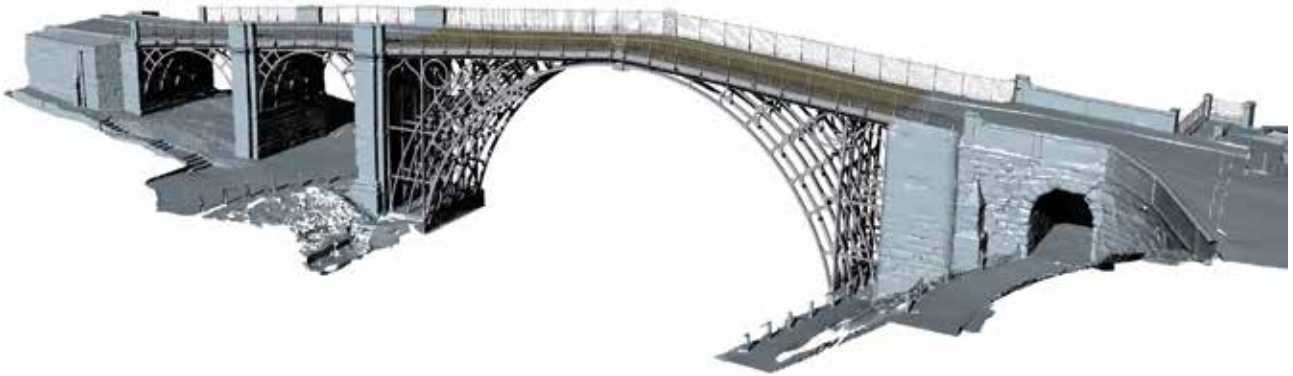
East elevation: originally the bridge was constructed with one river span, the southern two land spans were constructed in 1821–23
